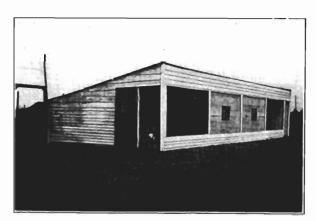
Exterior view of open front house showing style of construction outlined above. Note the two center curtains are lowered, showing the sash in the center to admit light.
